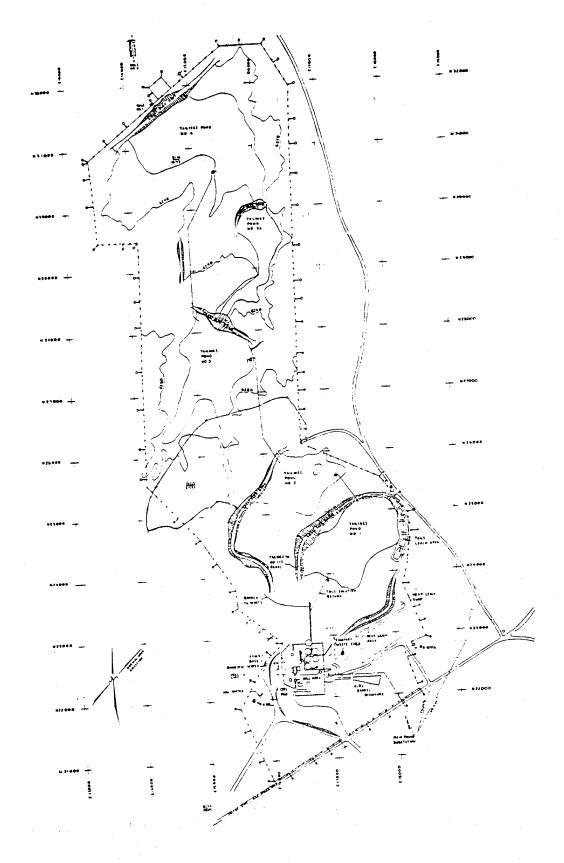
Plan View of the Pathfinder Millsite and Tailings Ponds
